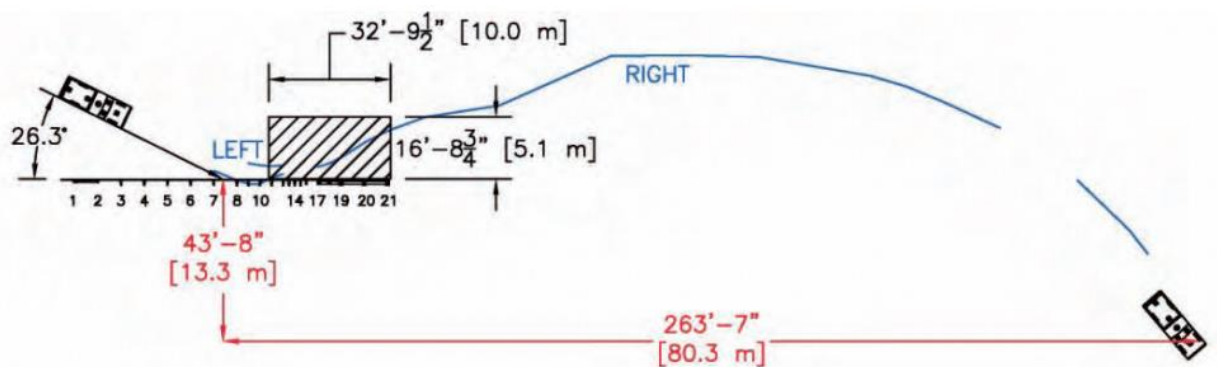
Test Impact Drawings for Test No. MWTSP-2.
